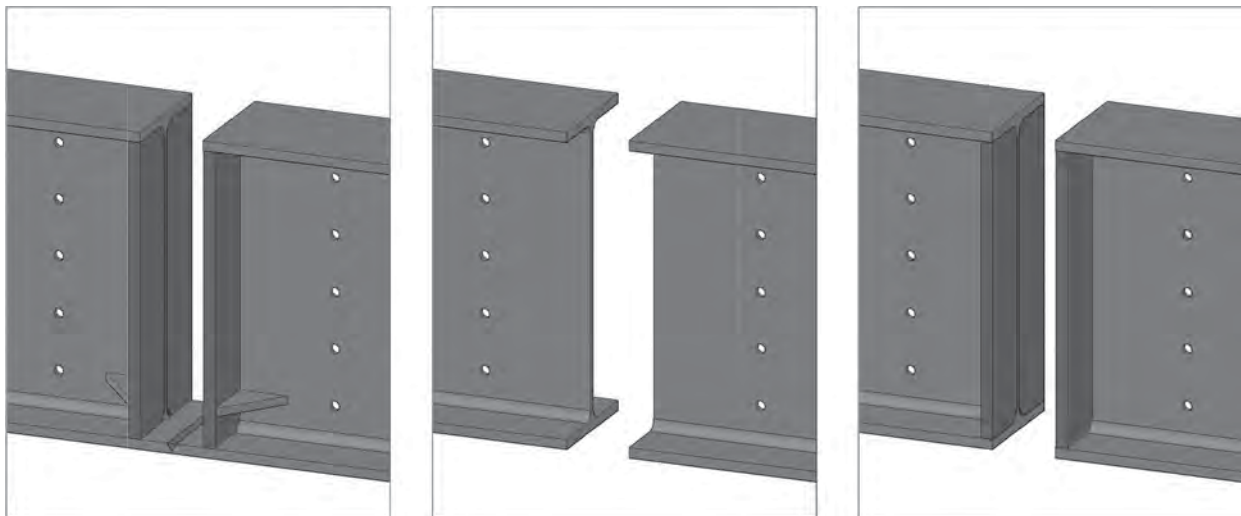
Details of test specimens inside the diaphragm: (a) specimen 1; (b) specimen 2; (c) specimen 3.
